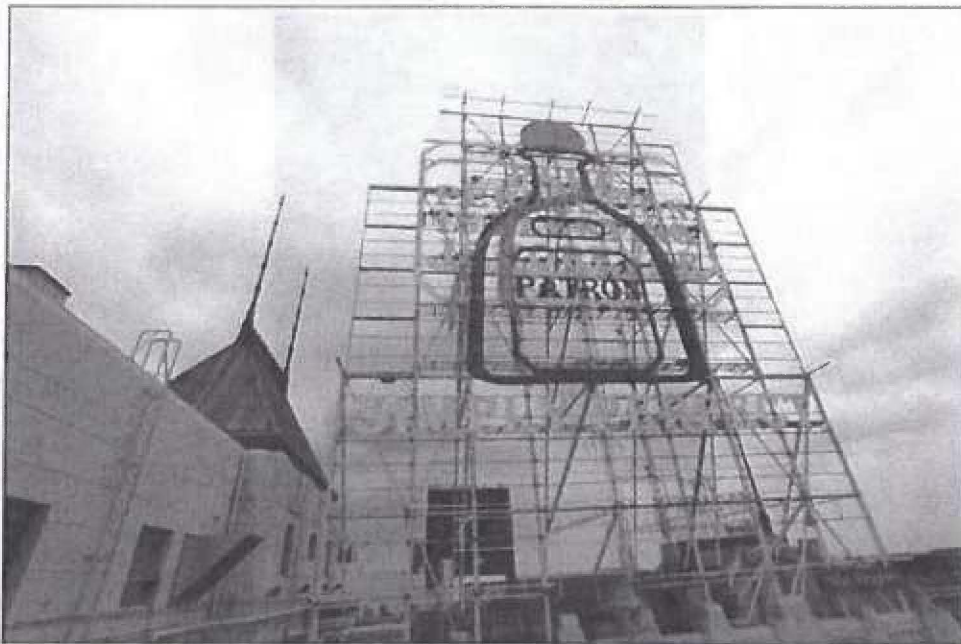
Bank of Hollywood / Equitable Building, roof with sign structure and penthouse, view south (Chattel 2014)
